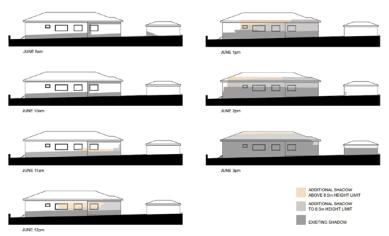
Overshadowing plans in elevation on No. 20 Kembla Street at mid-winter
